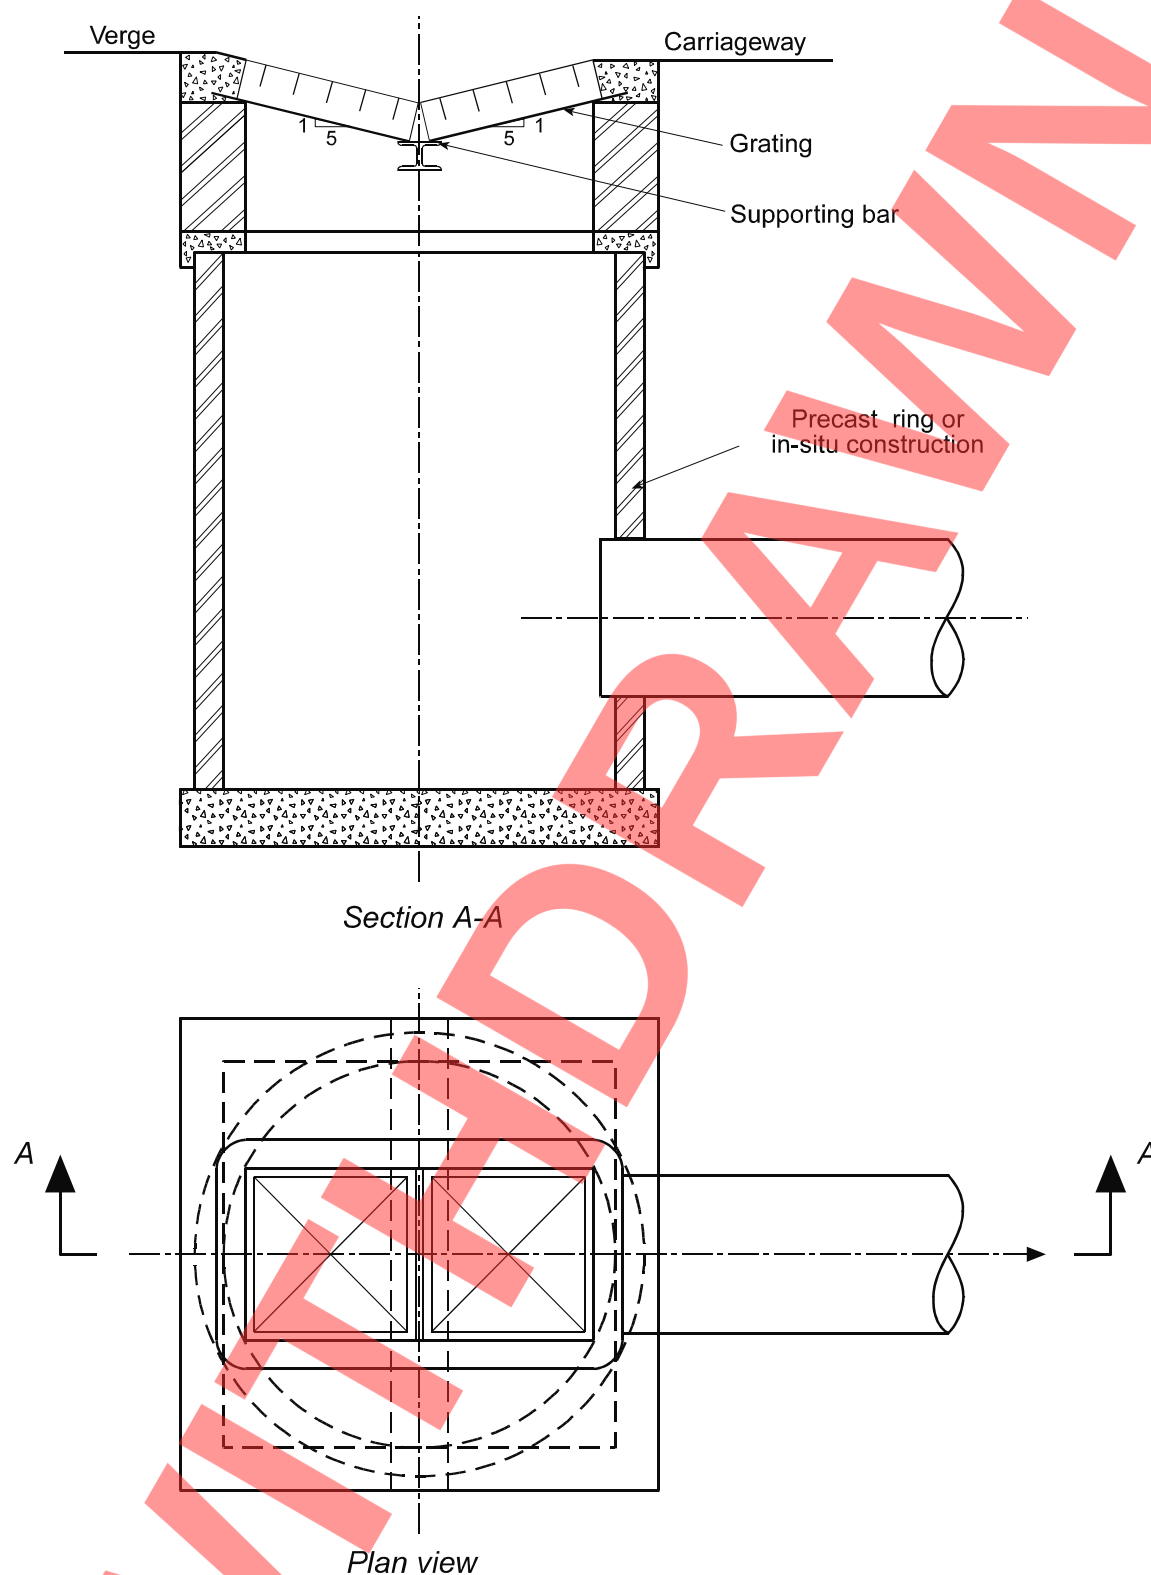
Example of collecting chamber for in-line outlet in triangular channel
